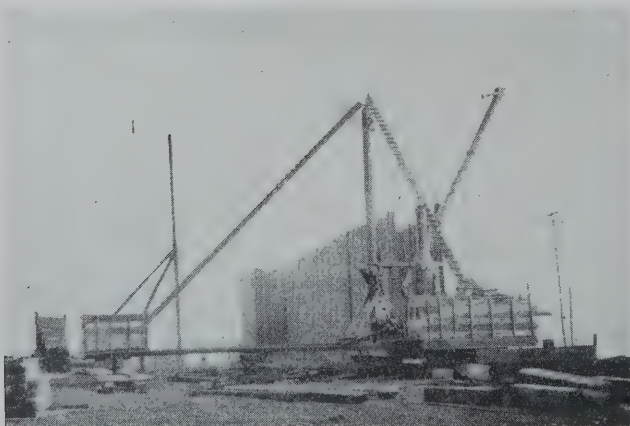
SHEET PILES IN POSITION READY FOR DRIVING.
